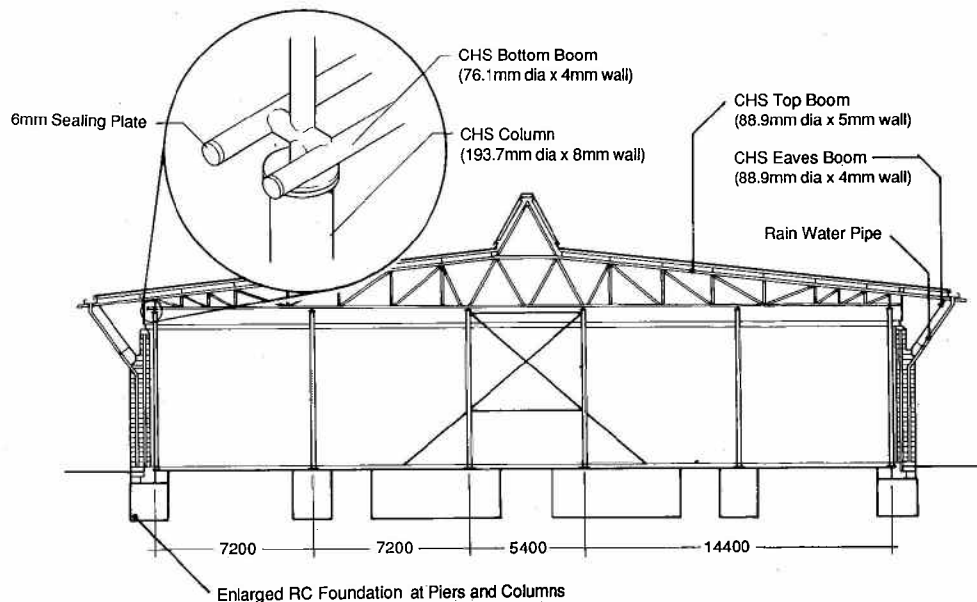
Section through warehouse truss span with pedestal and flange detail of truss/column connection
